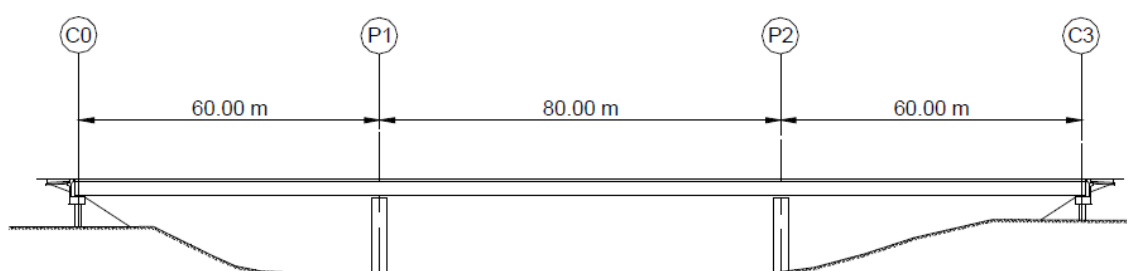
Example of a three-span steel-concrete composite bridge
